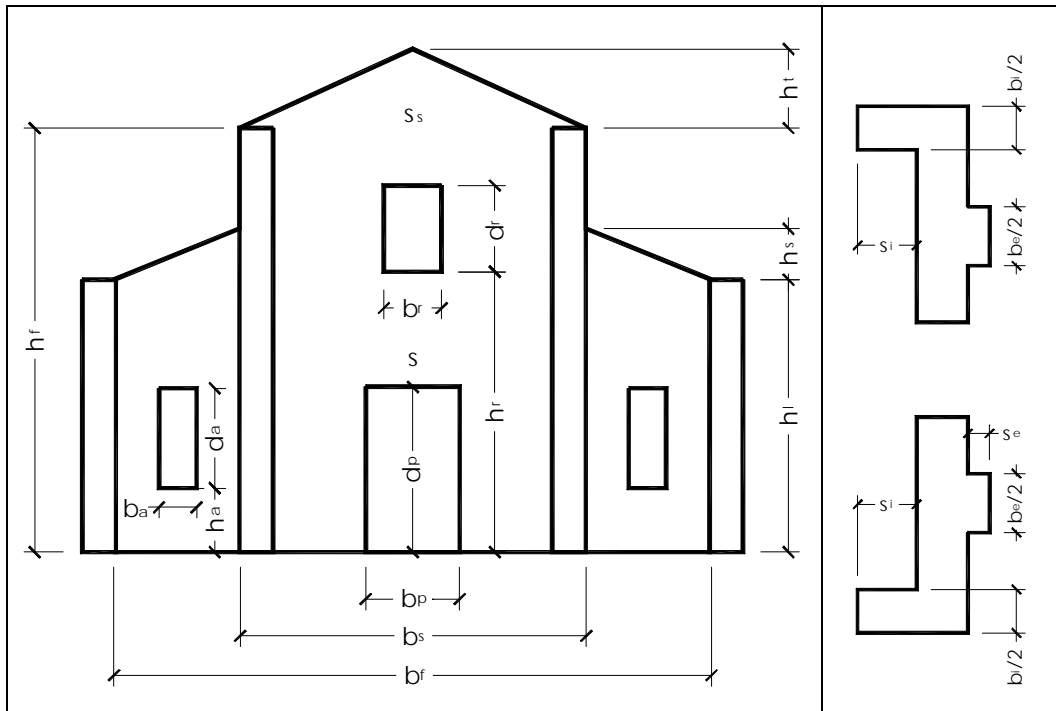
Geometrical parameters of the facade model, in elevation and plan.
